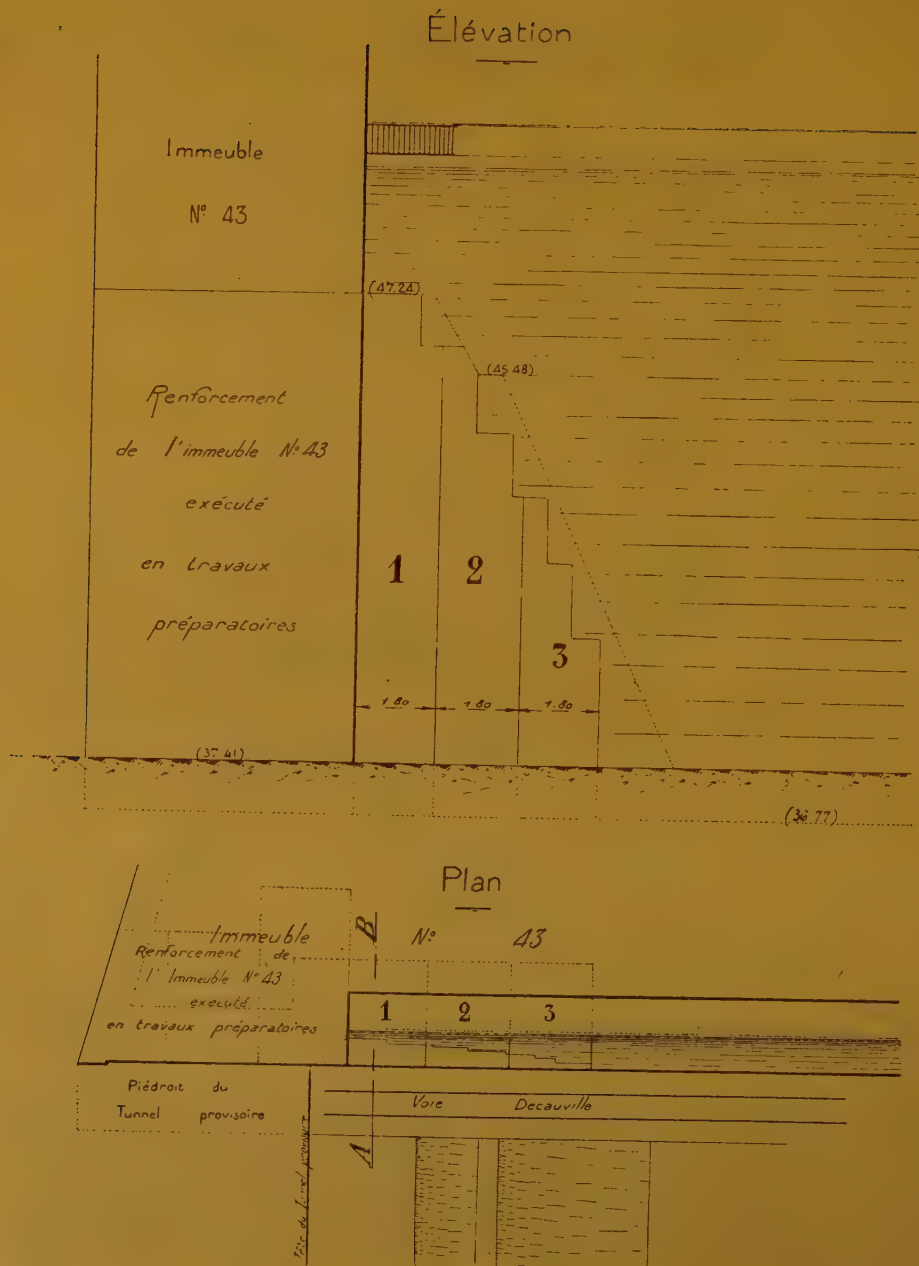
Under-pinning of foundations of No. 43, Boulevard des Batignolles. — Plan and elevation of retaining wall along side of railway.
